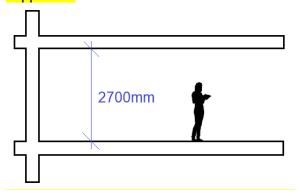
Minimum floor to ceiling heights for boarding houses and co-living housing
